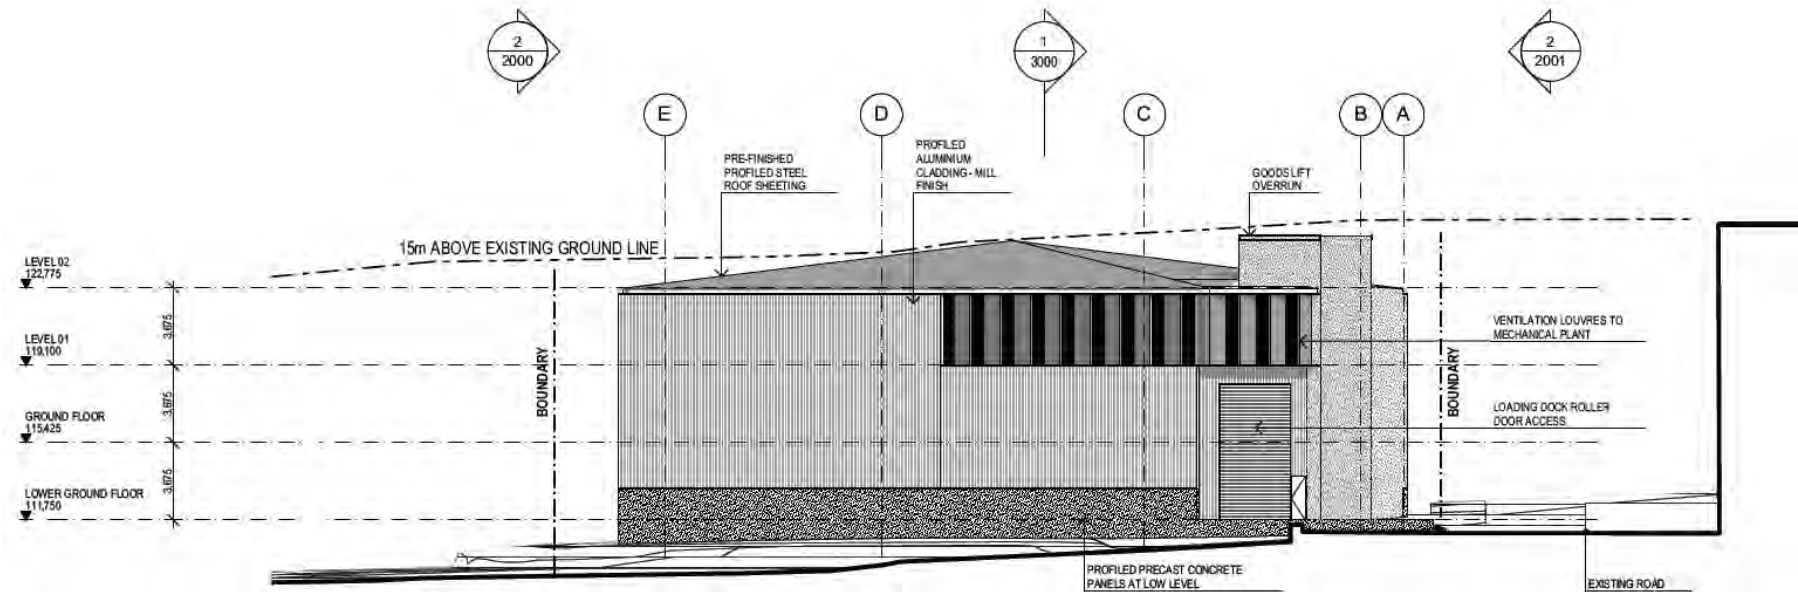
North Elevation (Lahznimmo Architects, DA2000, Rev.09, 7.08.2020)
